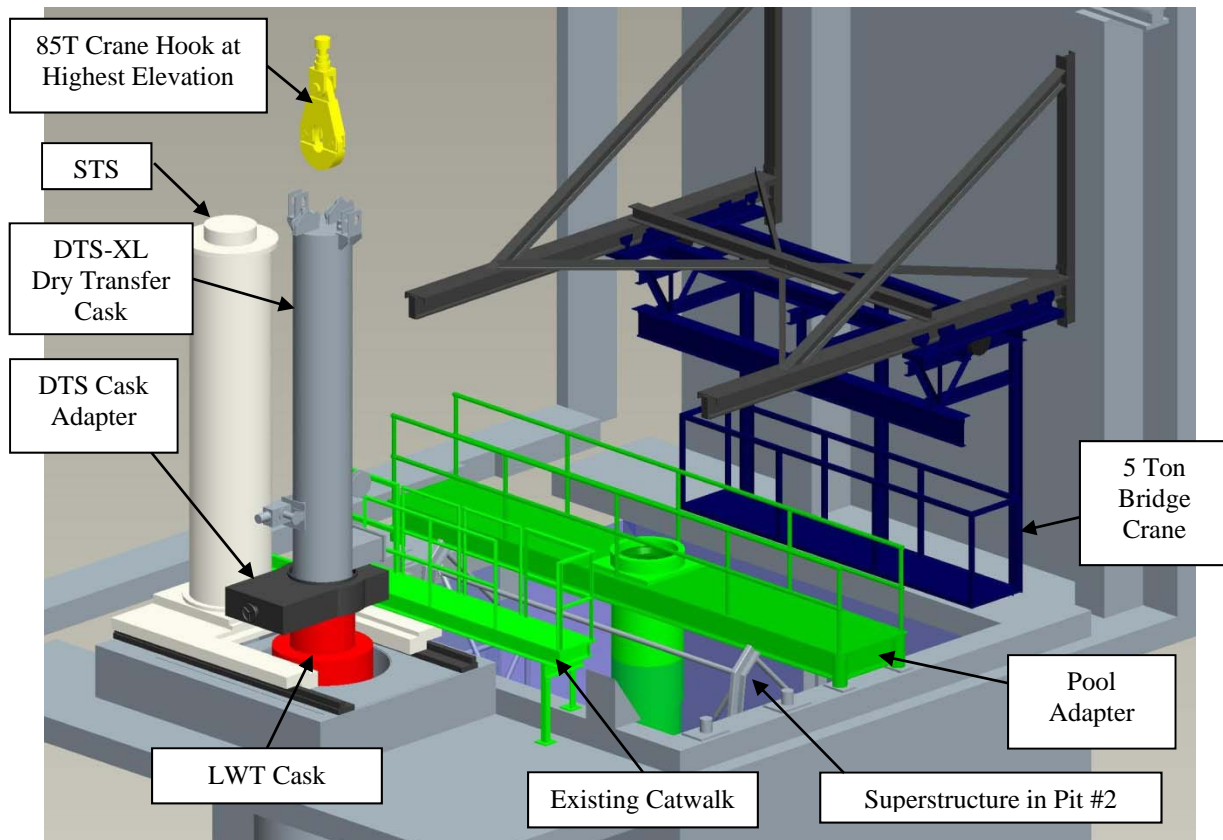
3D Model of Transfer Pit #1 (Under STS Structure) and Pit #2 (Under Pool Adapter)
